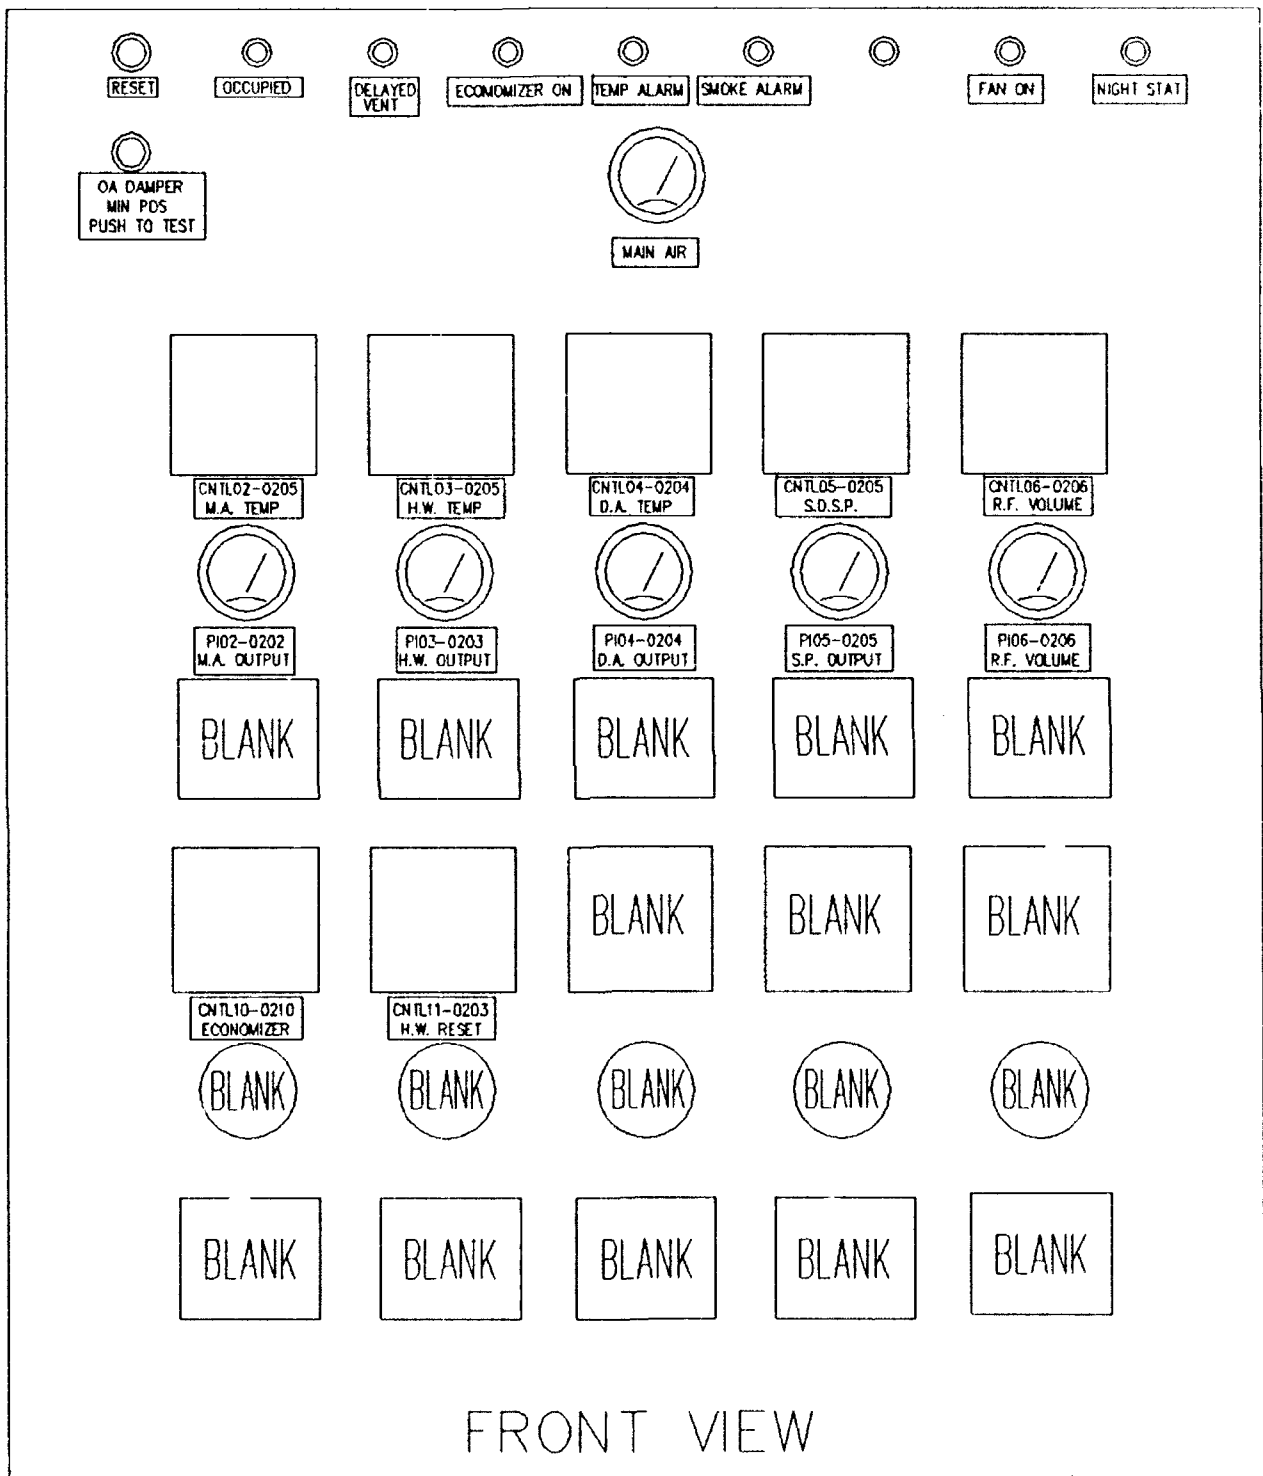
As-Built Inner Door Layout for Brown Hall Control Panel.
